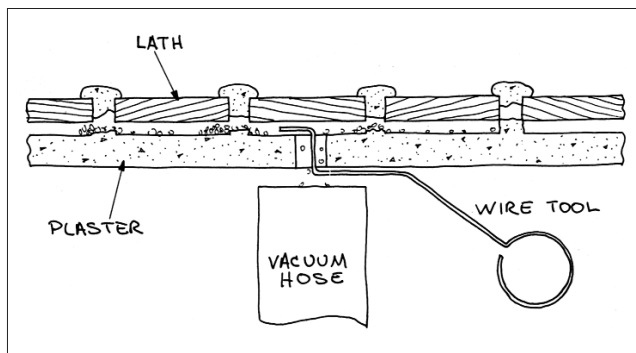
To make sure you can push the plaster back against the lath, vacuum the injection hole and clean out any debris with a wire tool.
